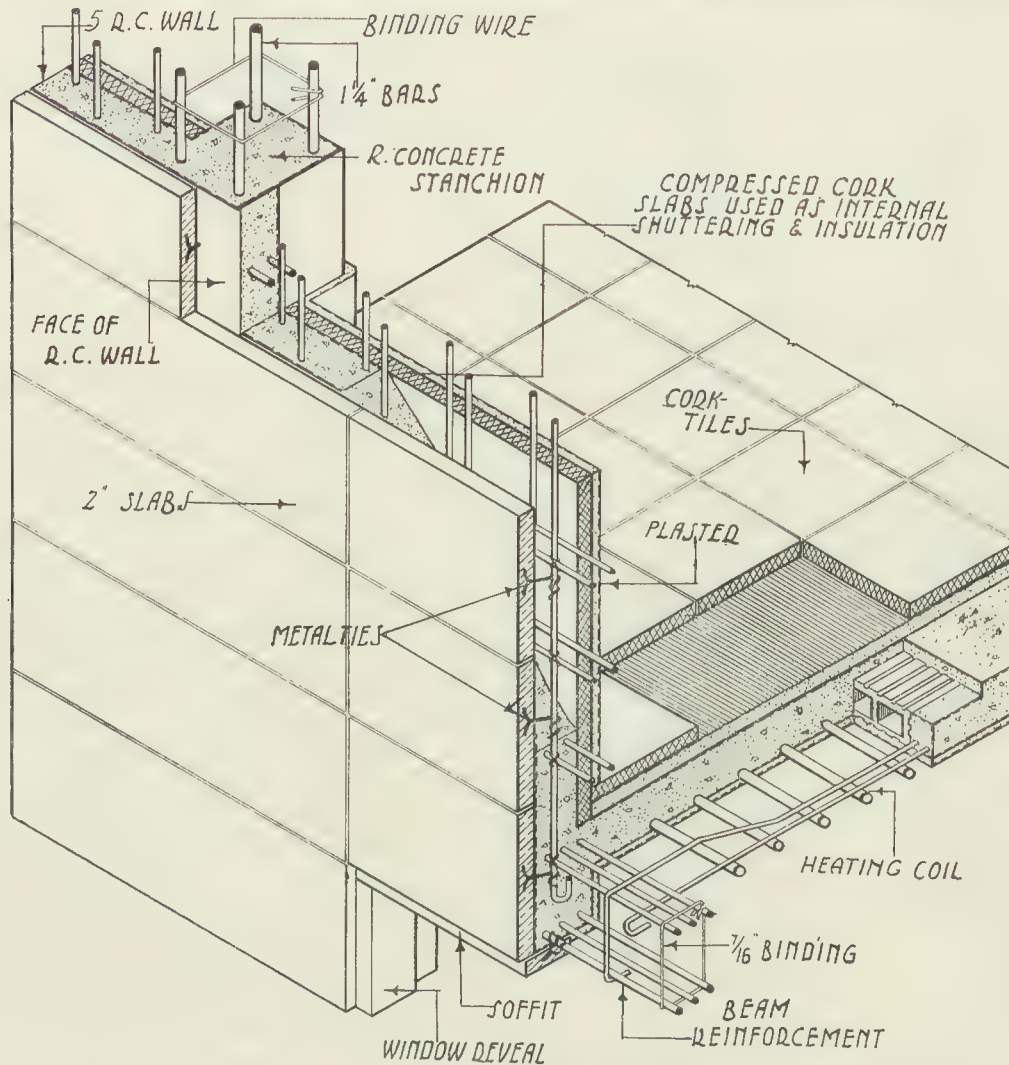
CONSTRUCTION OF REINFORCED CONCRETE WALL SLAB FACED ON BOTH SIDES
